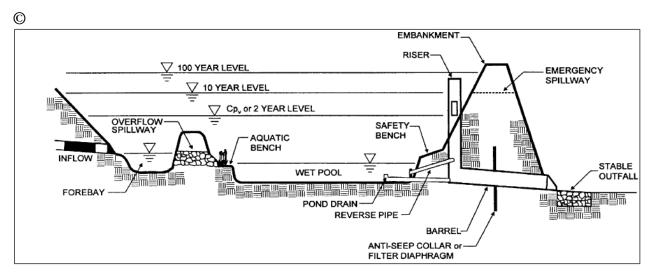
Typical Profile of Wet Pond (MDE 2000 Stormwater Design Manual)
